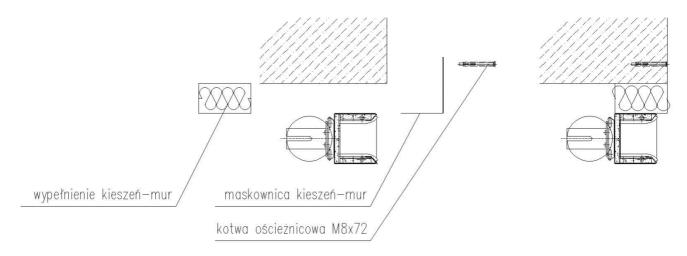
Installing the pocket - wall protective cover with fire-resistant filling
